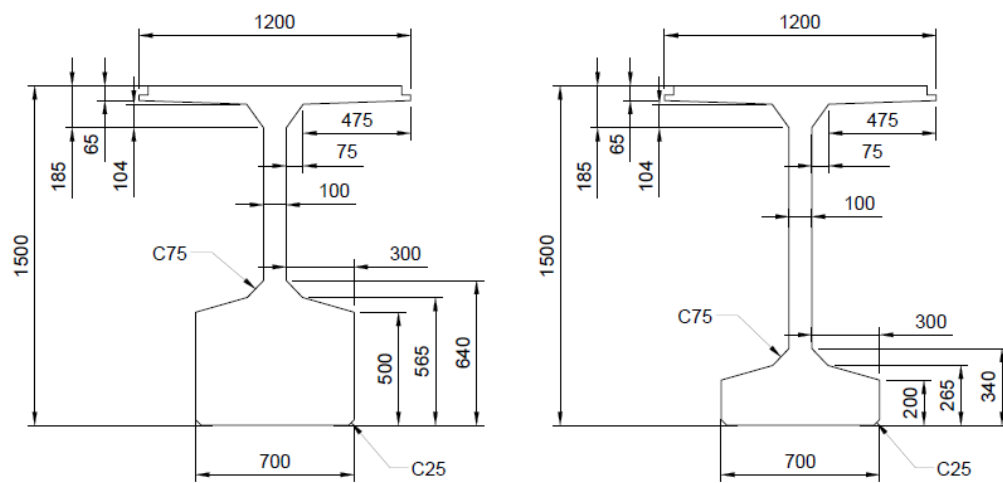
32 Girder section of 35m span UHPFRC post tensioned I girder at support and mid span
